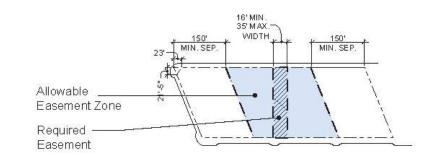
EASTSIDE TYPICAL BLOCK PLAN
